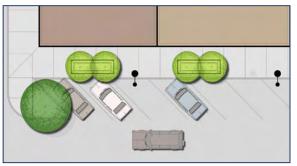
Typical Plan View of Mixed Use Core Street
